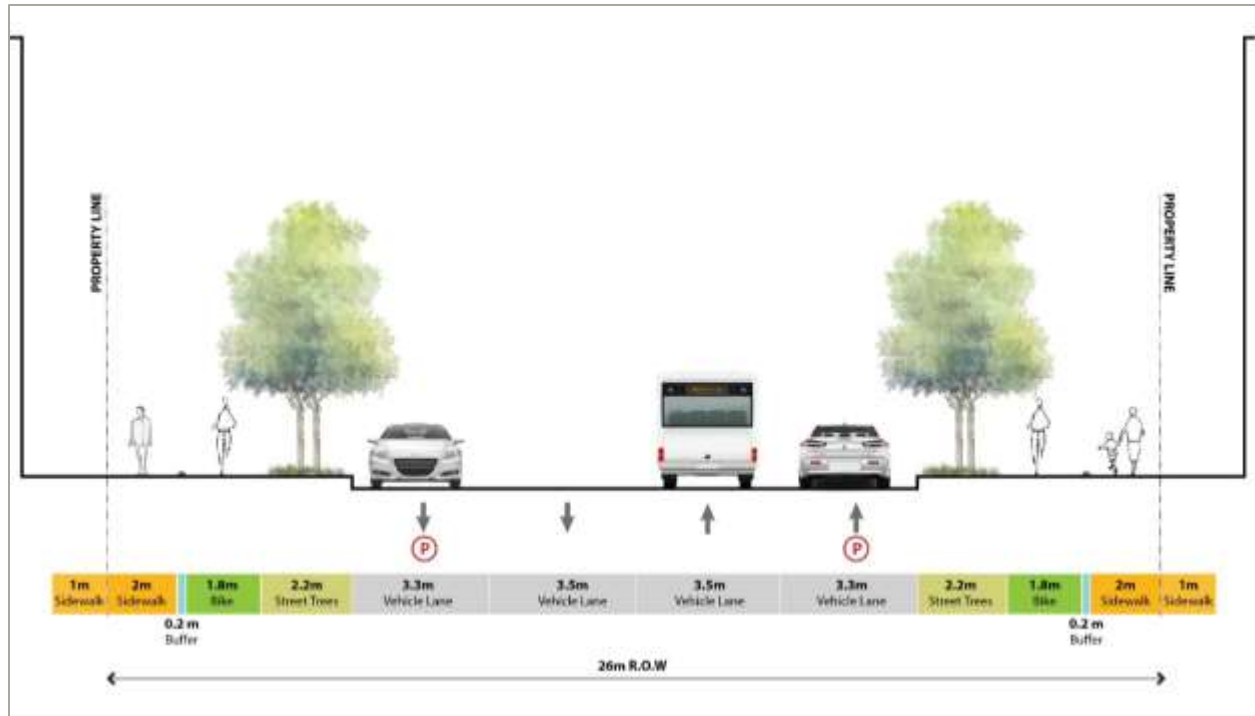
Major Collector Road Typical Cross-section, 26 metre ROW
